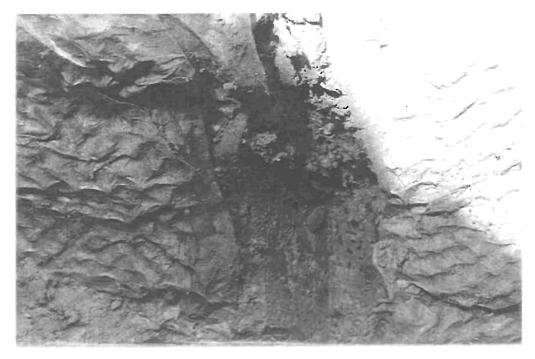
This photo shows a 20cm (eight inch) gap where adjacent curtain drain sections pulled apart, presumably during construction.
